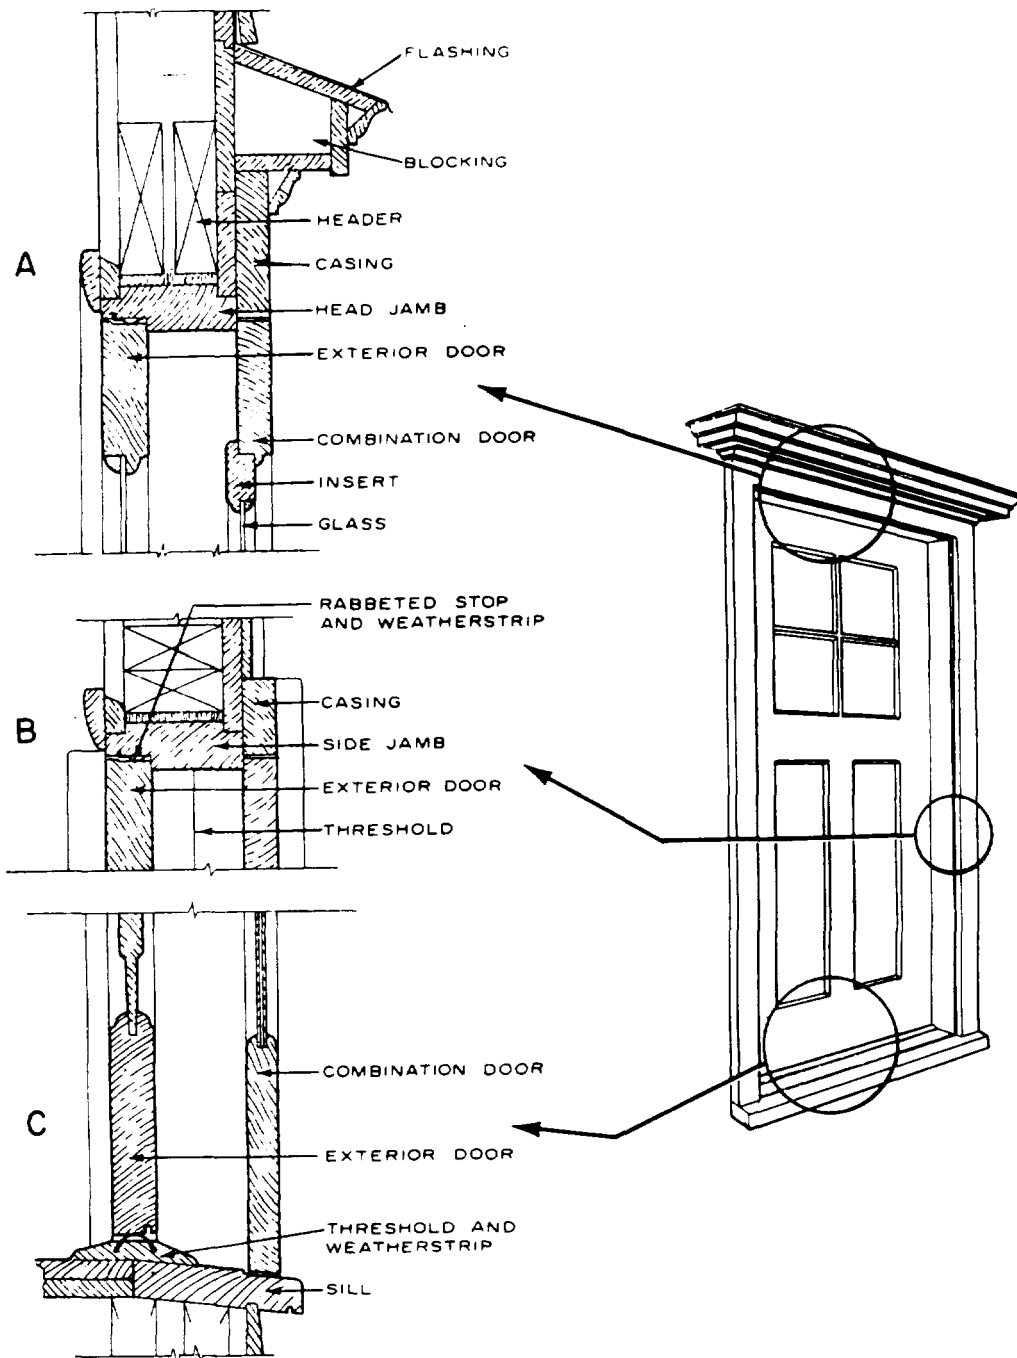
Exterior door and frame. Exterior door and combination door (screen and storm) cross sections: A. Head jamb; B. Side jamb; C. Sill.
